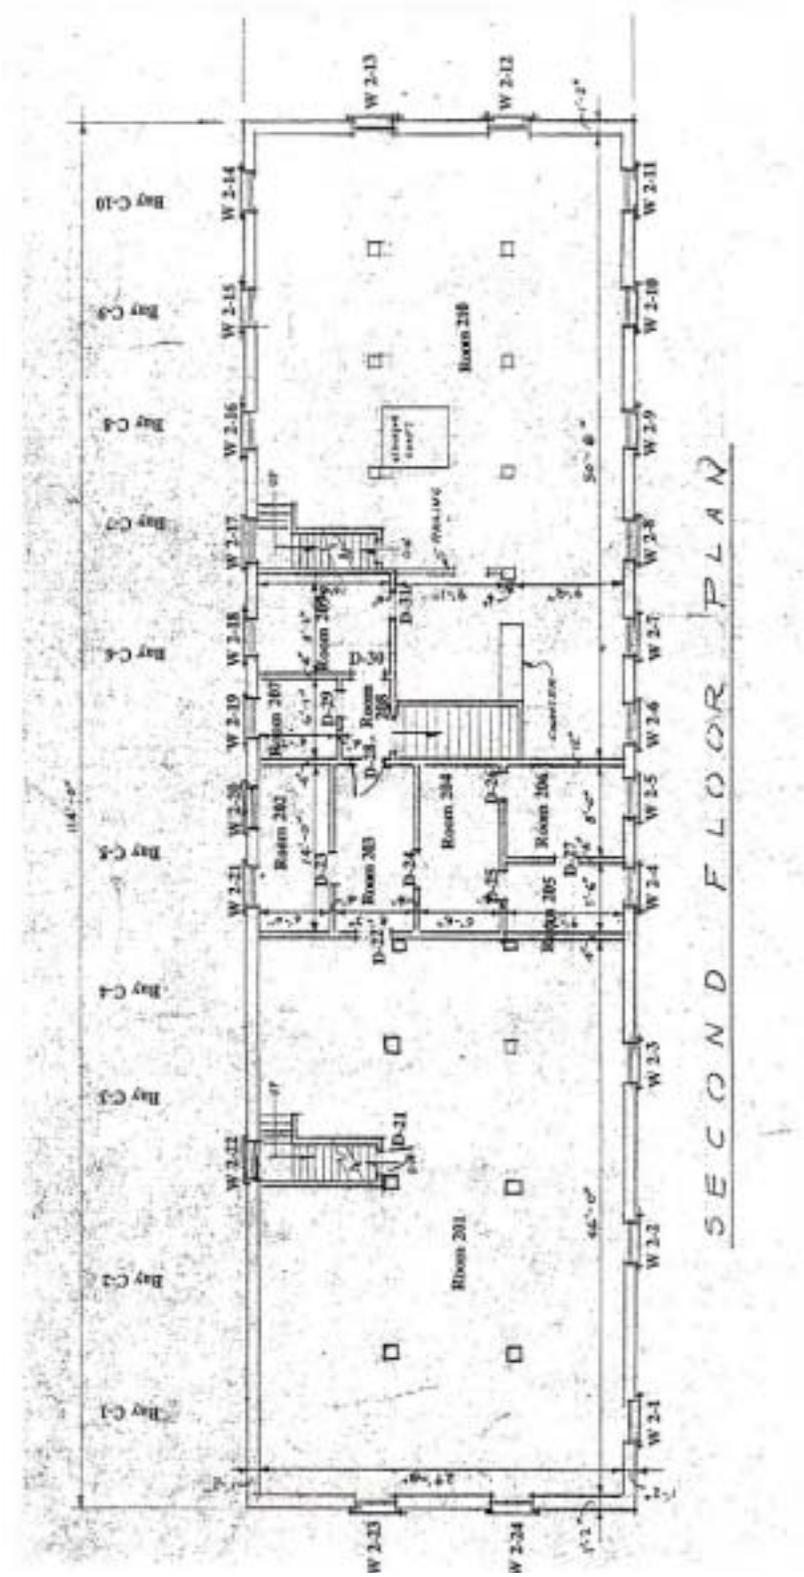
Second-floor plan of Building 32, showing scheduled rooms and openings [1960; annotated 1993].
